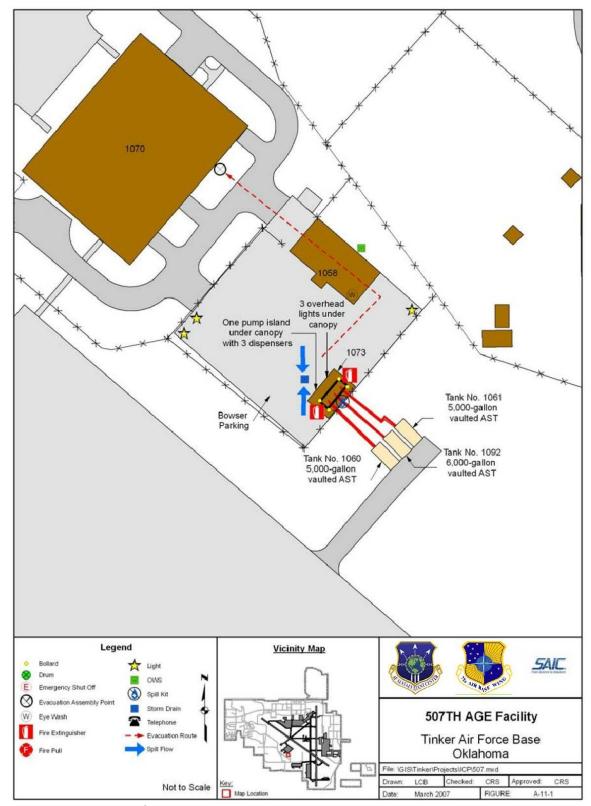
A: 507th Air Refueling Wing Aerospace Ground Equipment and Fueling Facility Diagram
